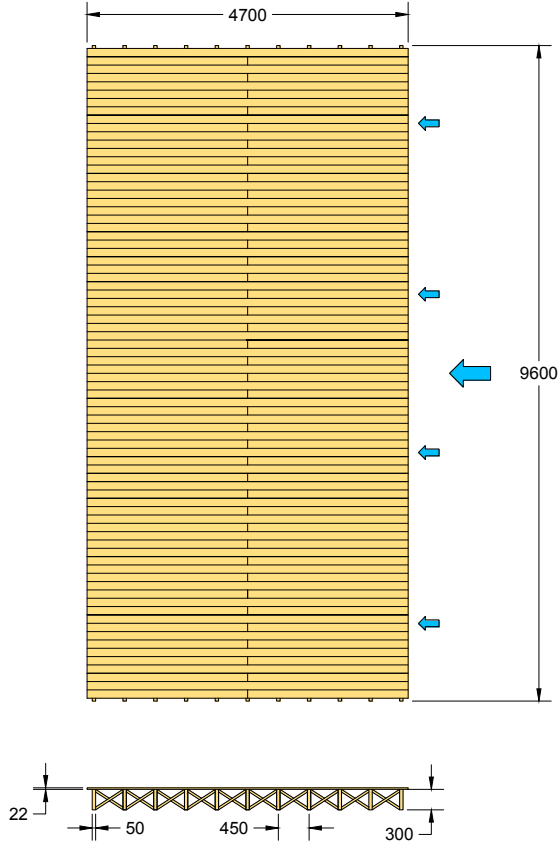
Timber diaphragm samples tested by [25]; dimensions in mm.
